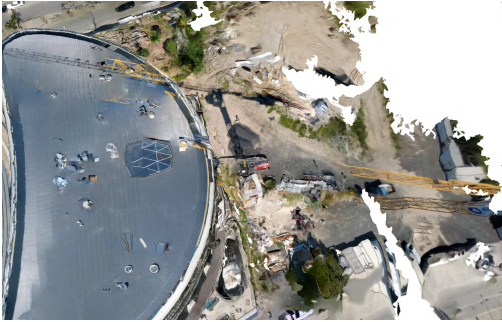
Projection of the construction crane on the building's roof and the floor as an example of texture failure after poor image alignment in Aerial Model.
